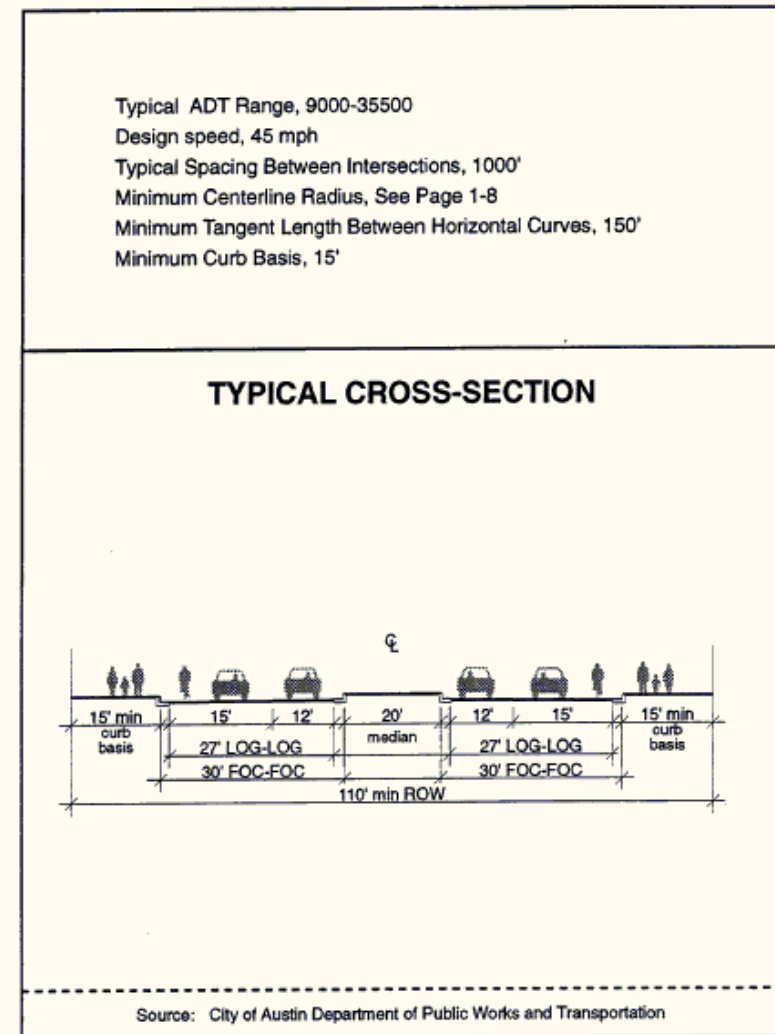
37C Cross section for 4 lane Minor Arterial Divided
